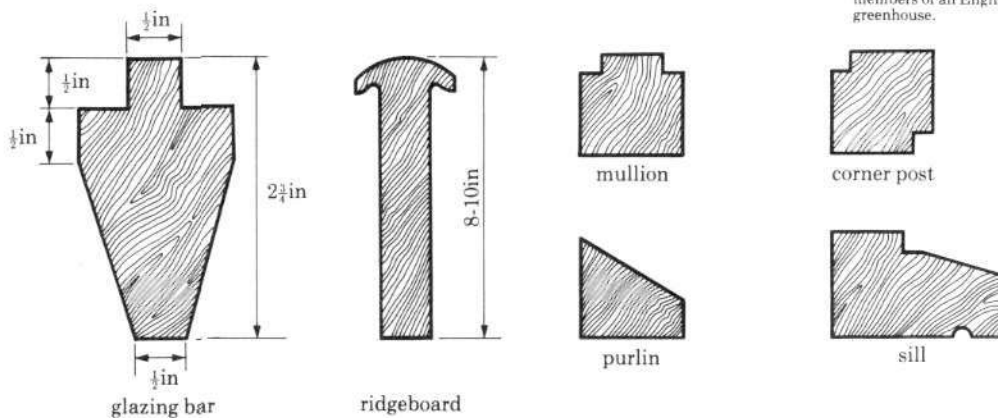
cross-sections of some common timber members of an English greenhouse.
